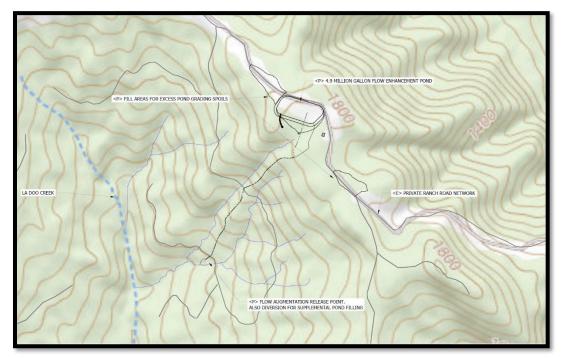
Project plan map, showing the previously-recorded Ladoo cabin, P-12-001312, as the square south of the east end of the proposed pond (north-center) along with proposed project elements; courtesy of Stillwater Sciences, Arcata.
